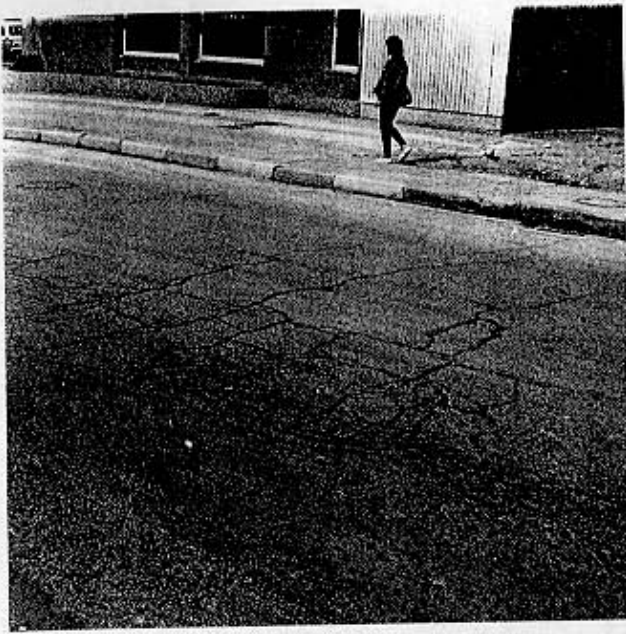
Failure of asphalt road (dense rutting and cracking) at the access way to the junction.
